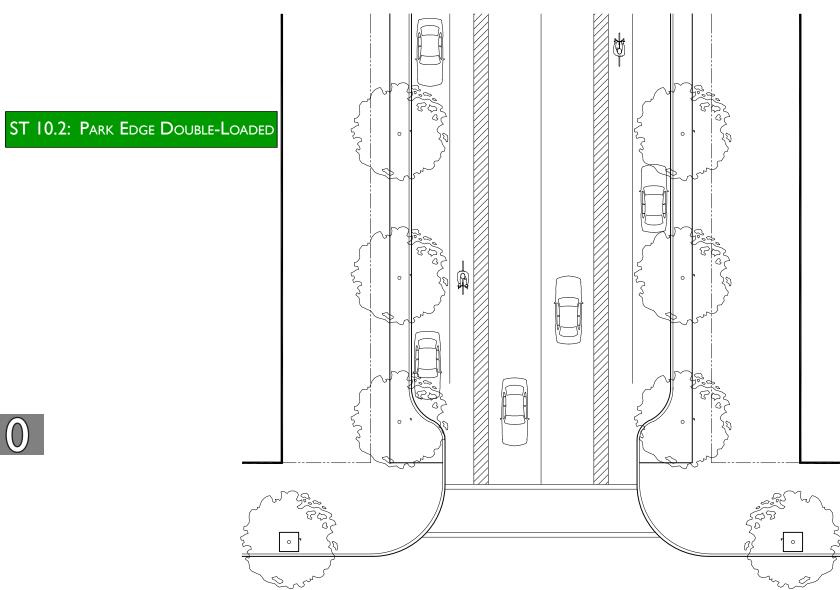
STREET TYPE 10.2: TYPICAL INTERSECTION (PLAN VIEW)
